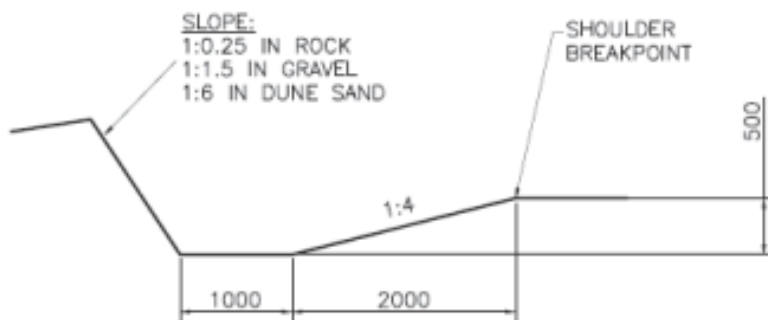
Cross Section in Cut (RA Standard Drawings 2014)
